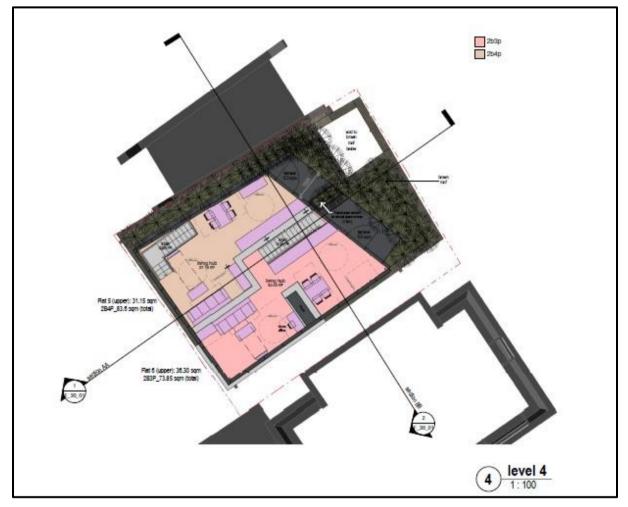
Layout of Proposed Development at 4th Floor Level
